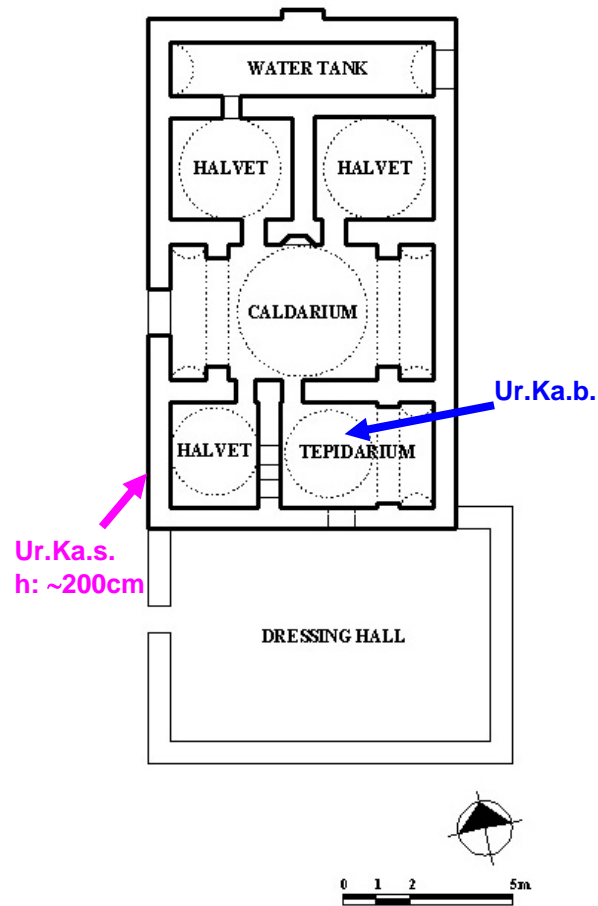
Plan of the Kamanlı Bath in Urla (Reyhan 2004), showing where stone masonry mortar samples (Ur.Ka.s) and brick masonry mortar samples (Ur.Ka.b.) were collected.
